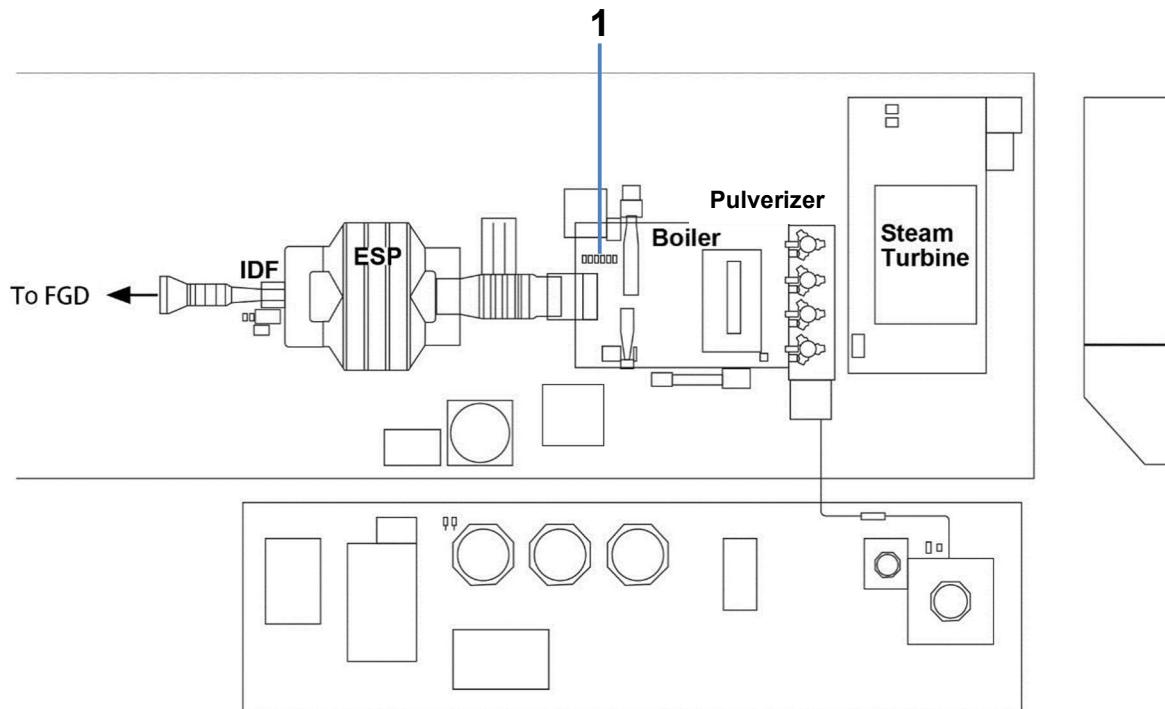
Cooling and Sealing Air System Arrangement (Typical arrangement example)
